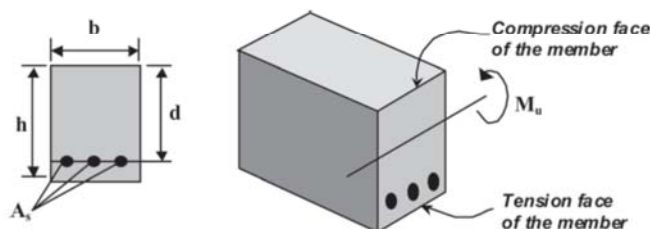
Design dimensions for moment strength: tension reinforcement only.
